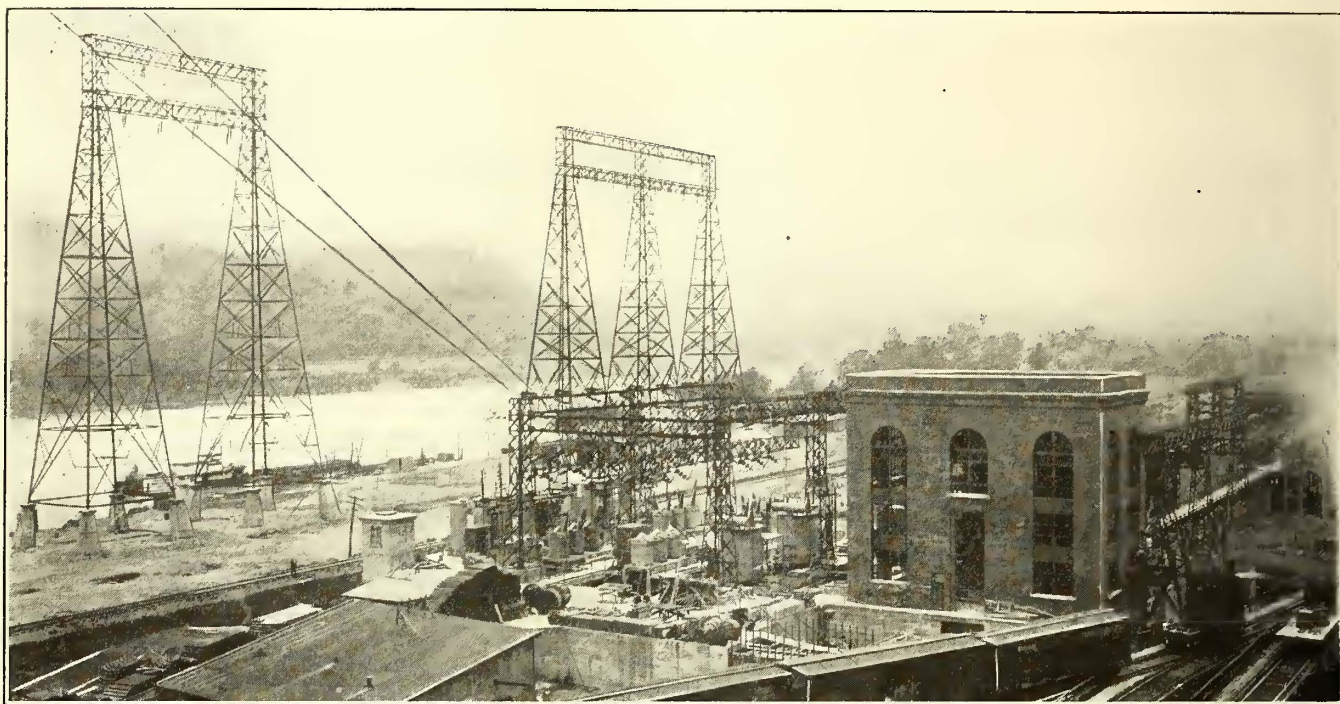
SWITCH YARD OF AMERICAN GAS & ELECTRIC COMPANY, WINDSOR POWER PLANT
